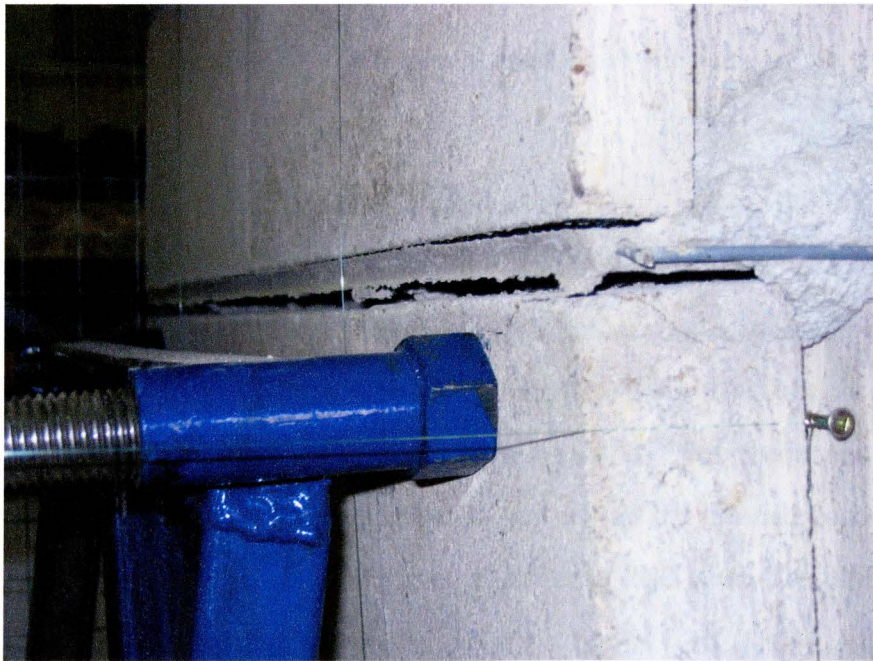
Horizontal mortar joint cracking in WA-4
